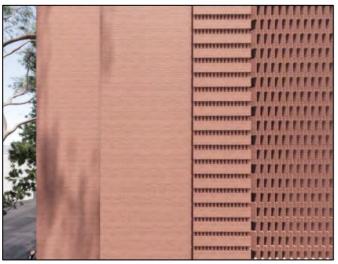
North/south façade detail (Source: applicant Design Report, Smart Design Studio)
